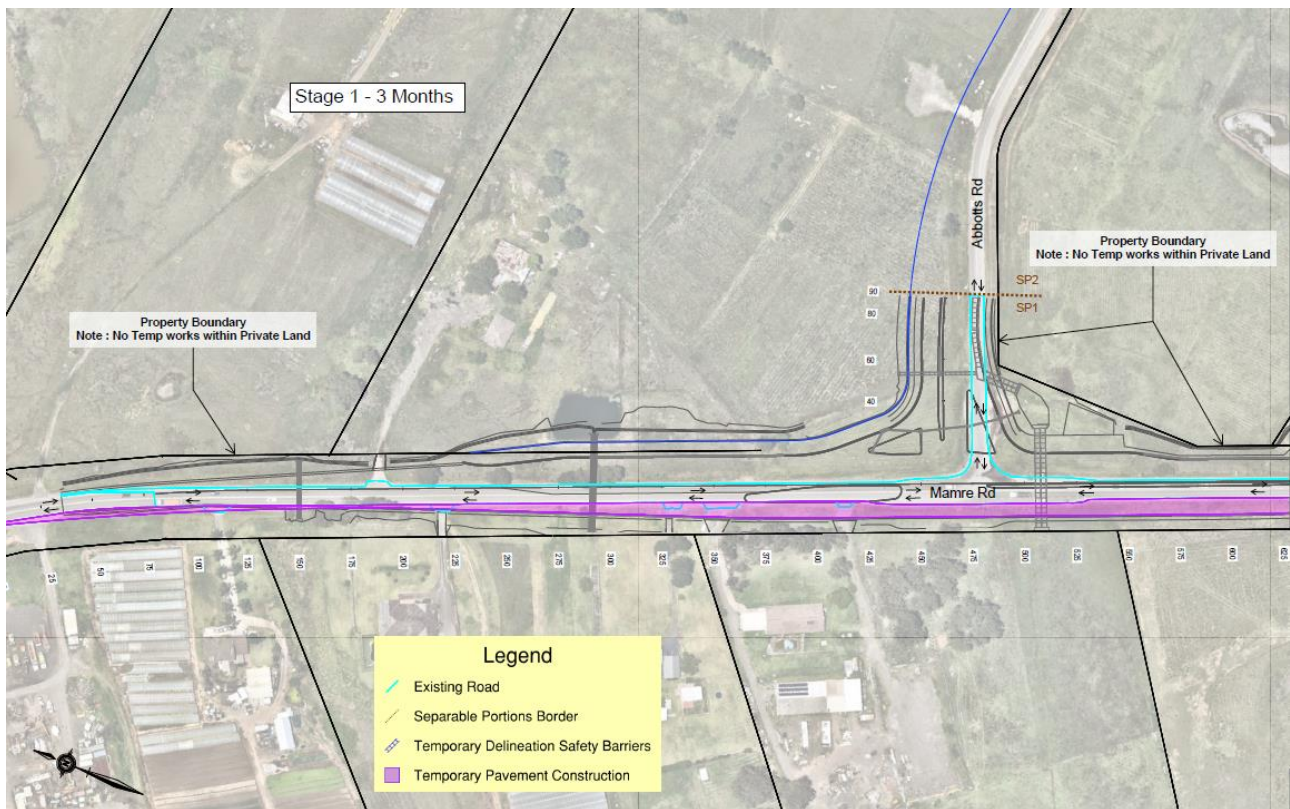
Mamre Road/Abbots Road Upgrade Layout- Construction Stage 1
